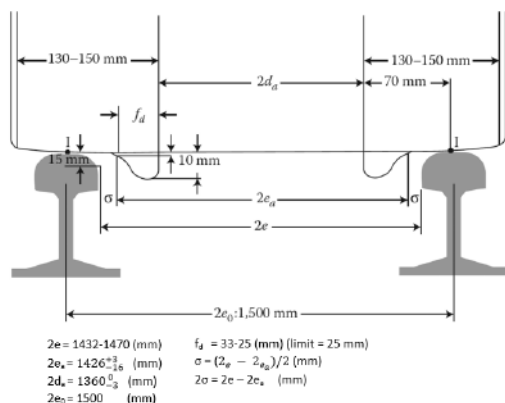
Standard gauge railway - geometric and constructional dimensions [8]
